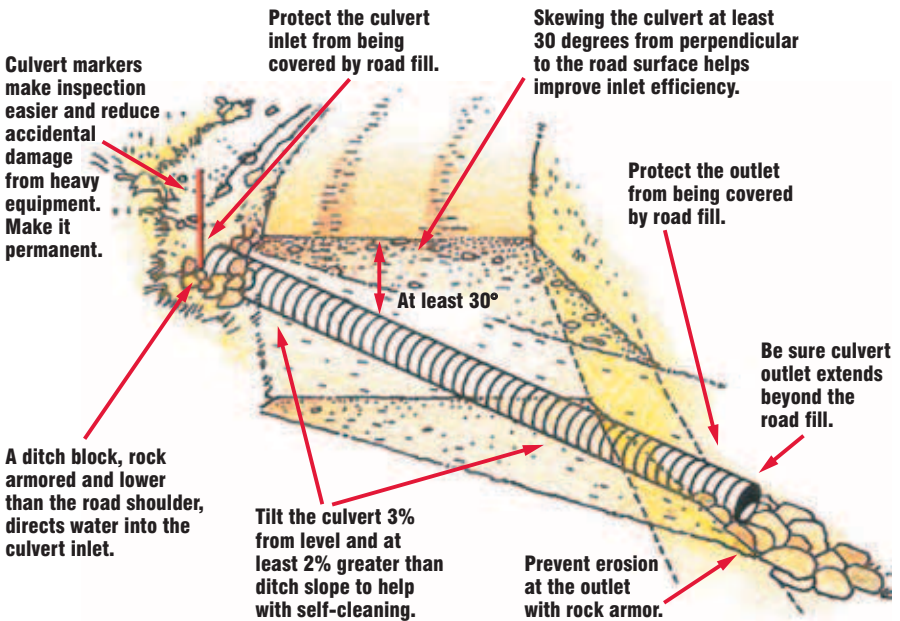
Diagram of recommended procedures for ditch-relief culvert installation.
